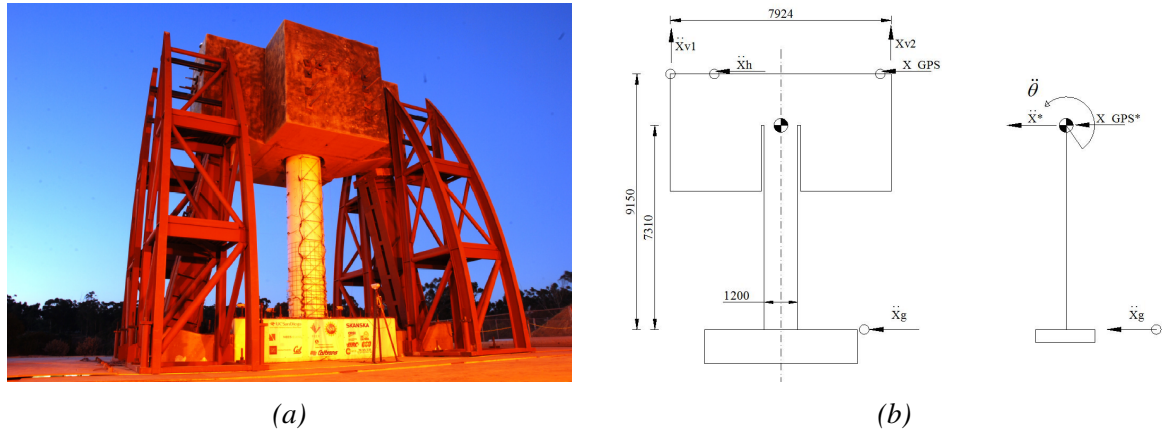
a) Bridge pier on the shake table [165]; and b) sensor location with basic dimensions
